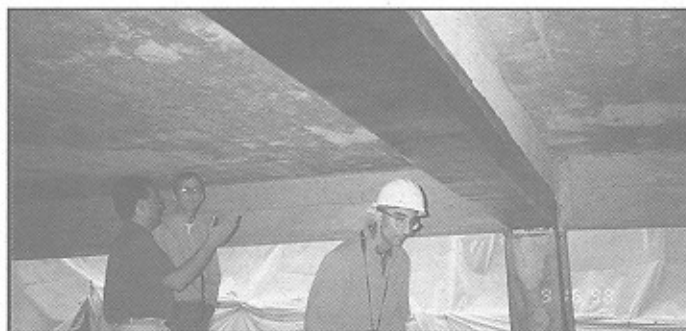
Flexural strengthening of the bridge beams of Horsetail Creek Bridge
